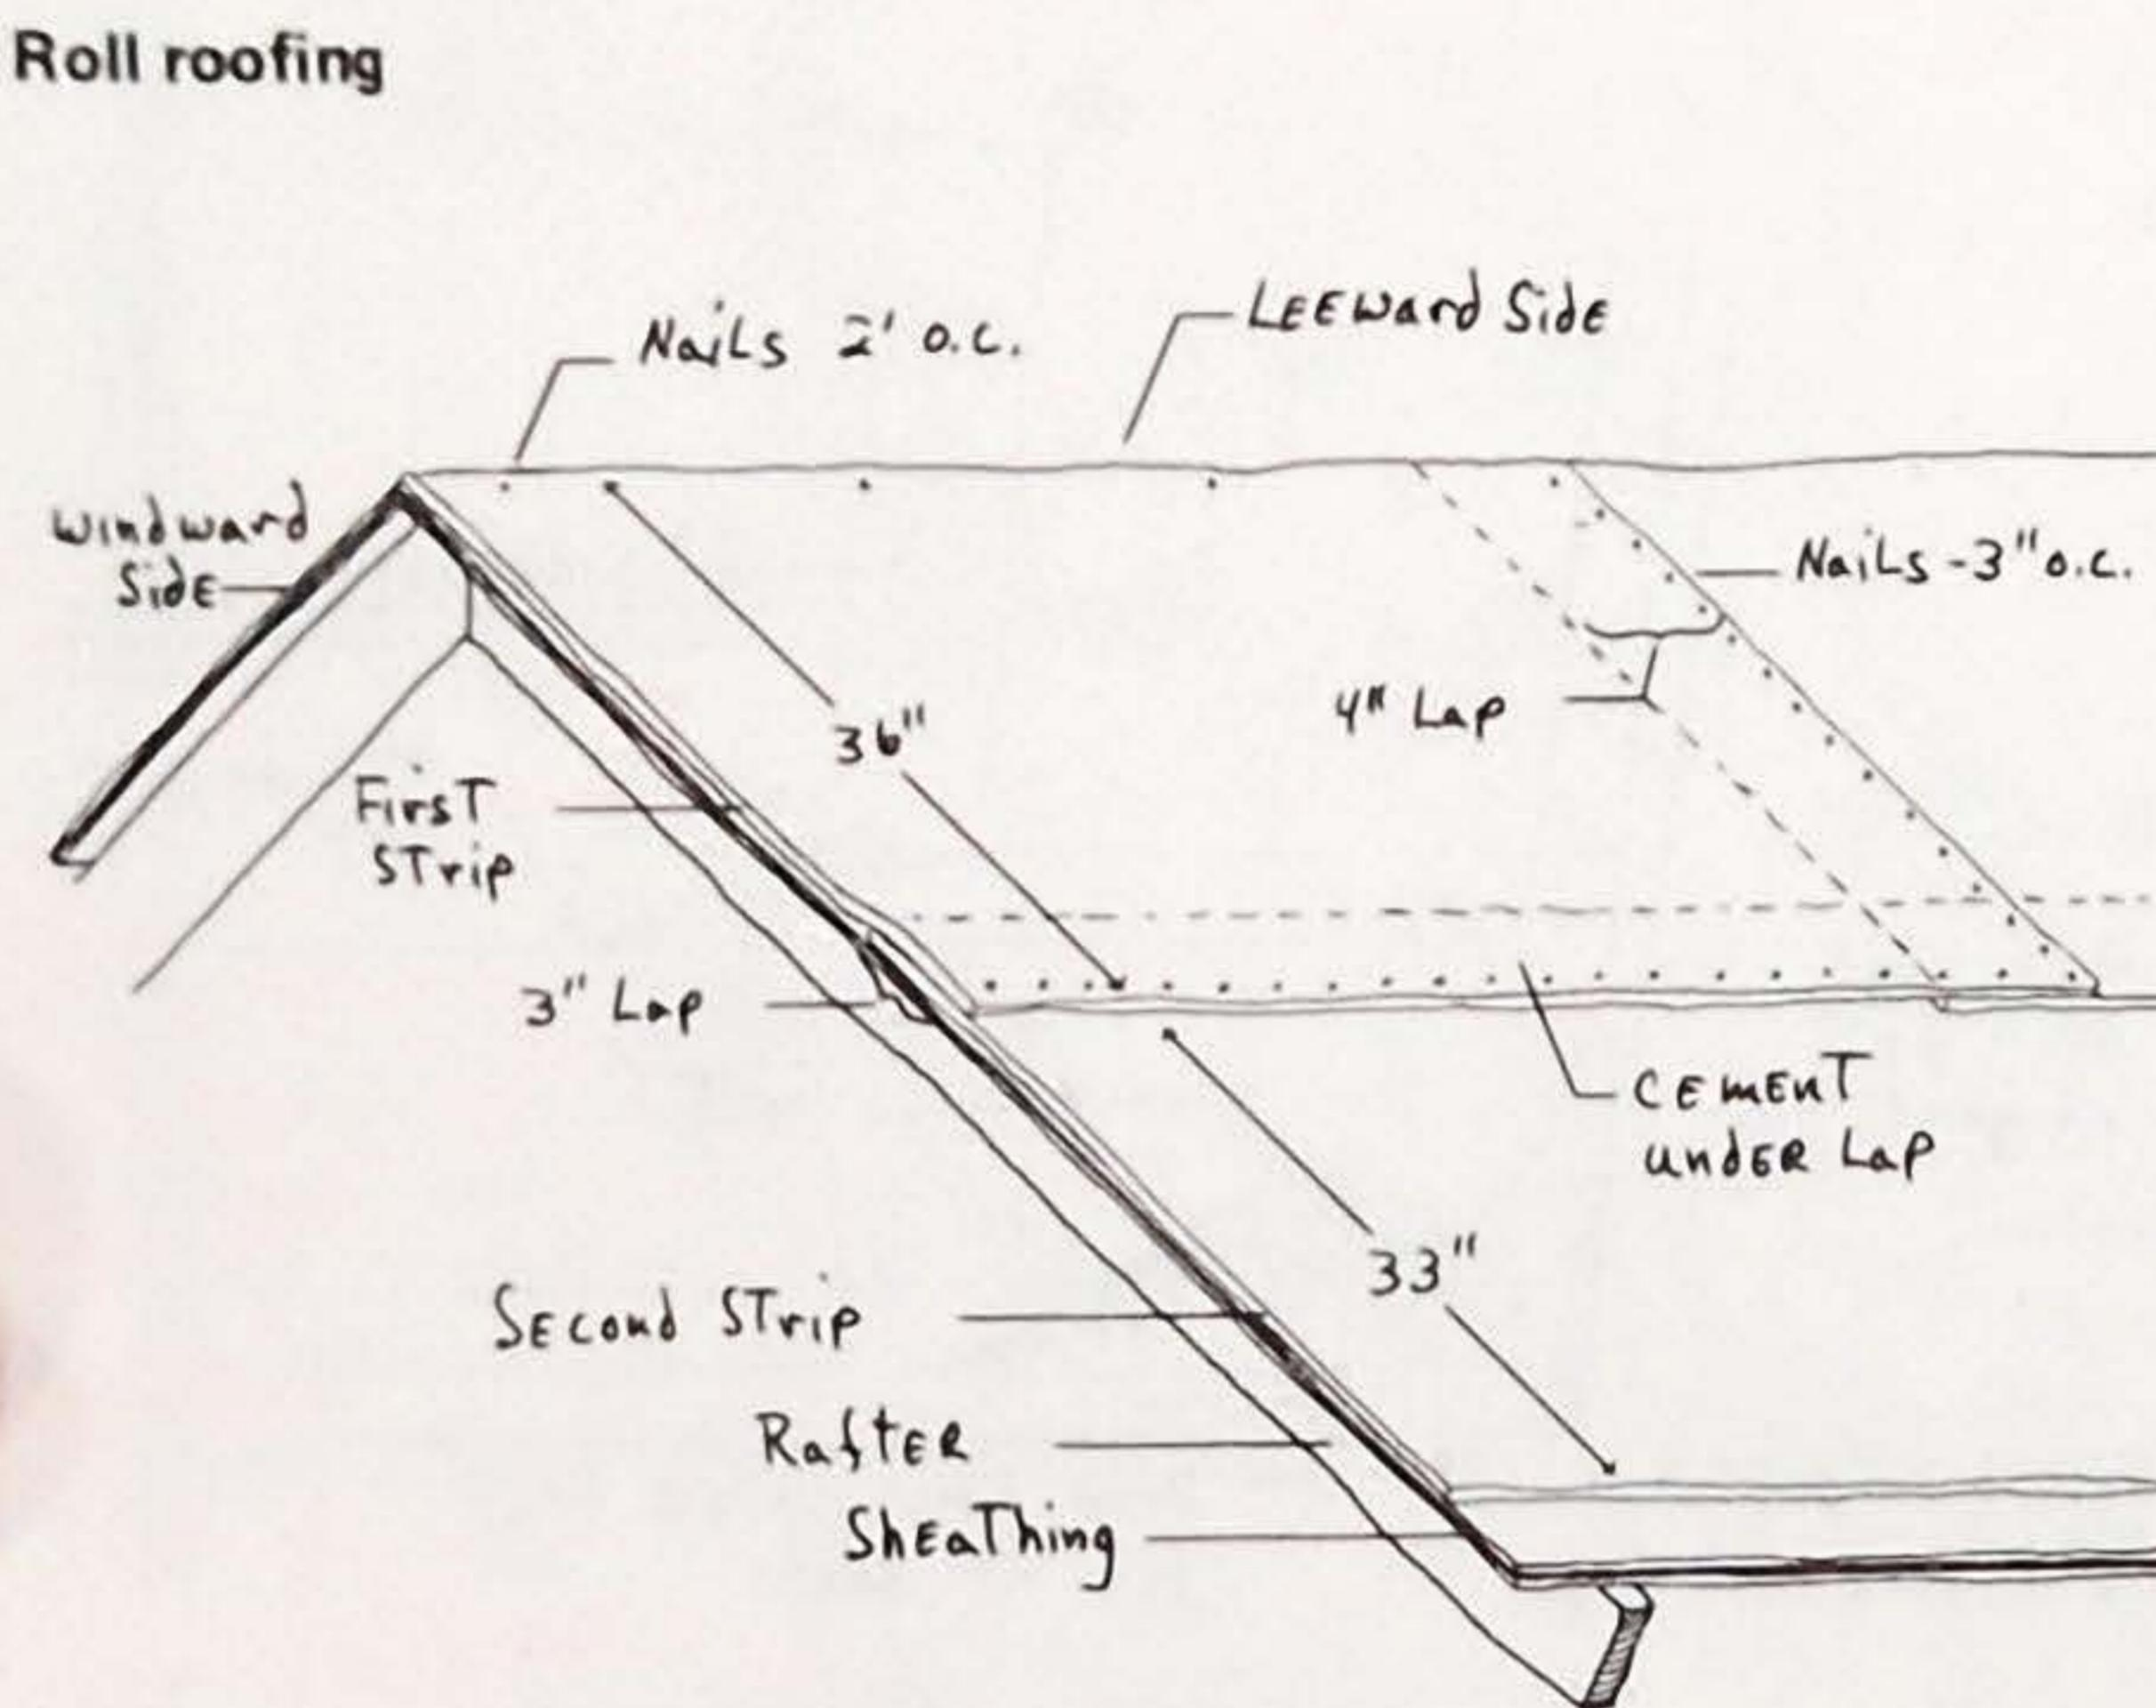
Installing the FIRST STRIPS of ROLL ROOFING
